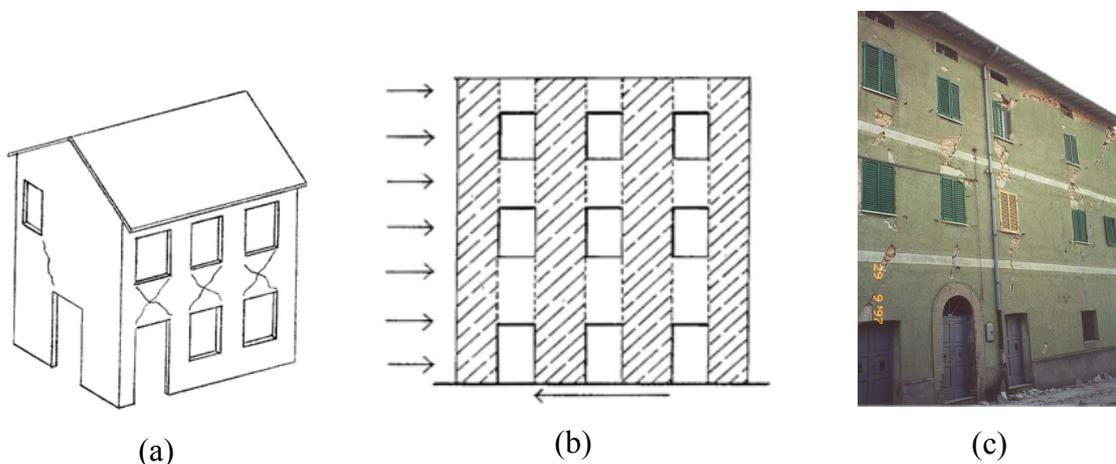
In plane mechanisms; Shear of the floor Bands (spandrels), (Franchetti, 2008)
